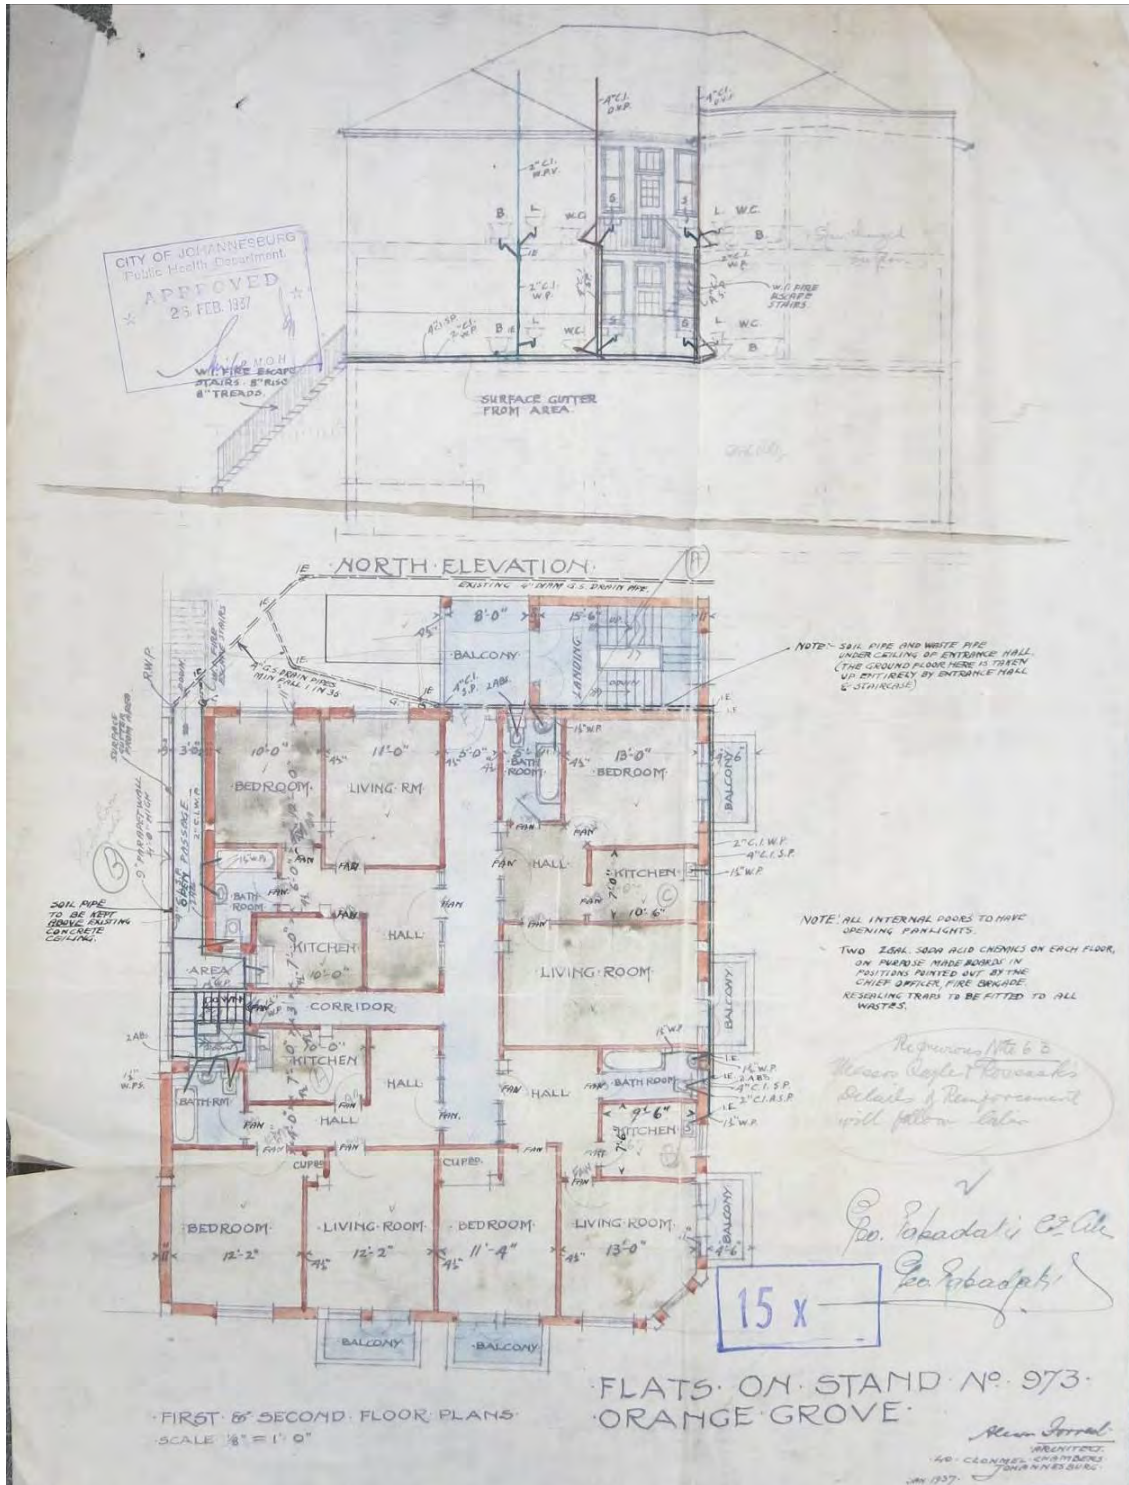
Original plan of proposed flats on stand 973, Orange Grove
